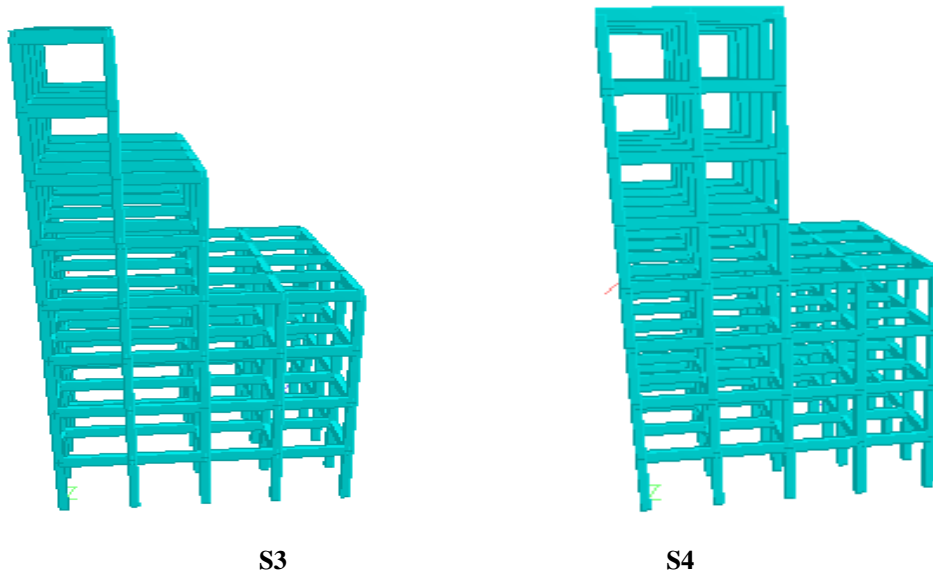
3D Rendering View, Eight Storey Building Frame
